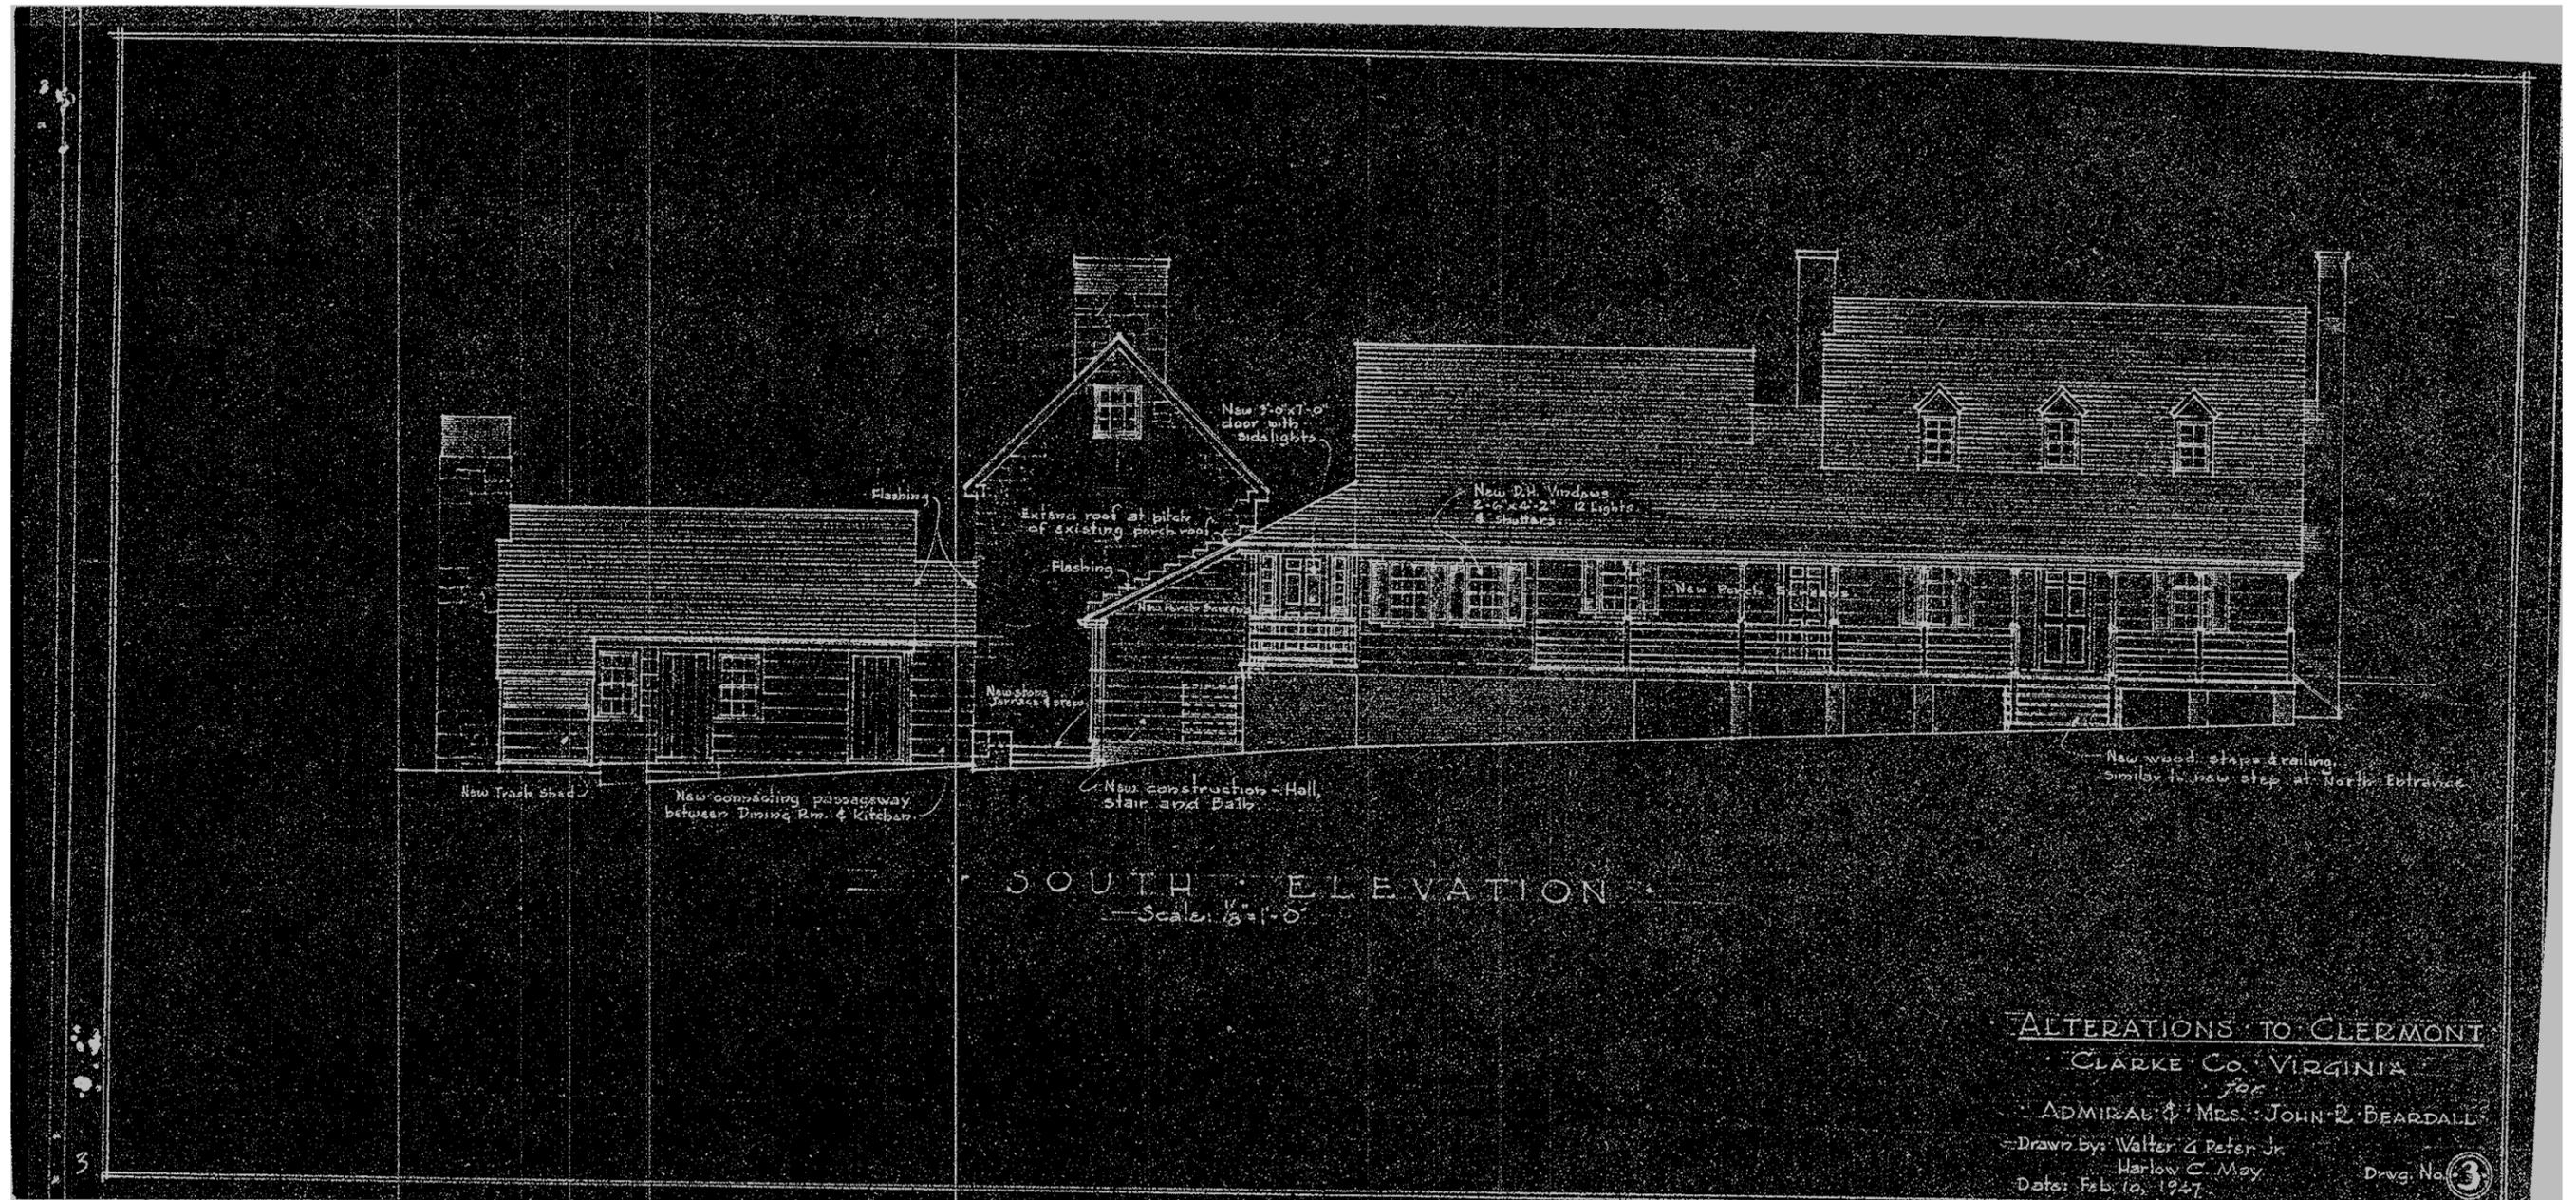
South elevation of the 1947 alteration construction drawings (not to scale).
